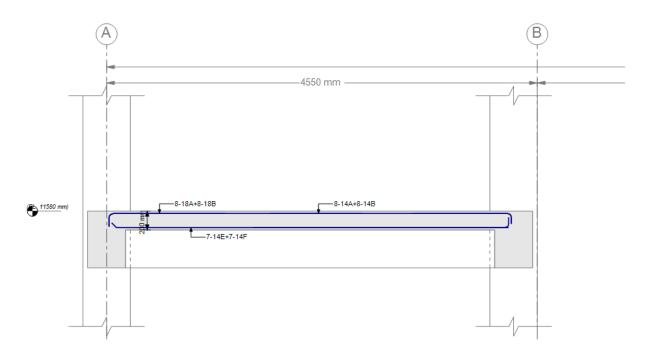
Slab detail storey 1 slab detail(A-B axes)
